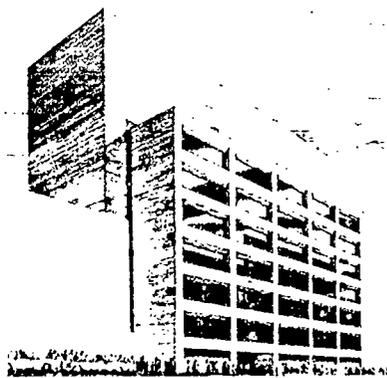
Bank Street School, perspective from 112th Street Harry Weese and Associates Architects, 1970
